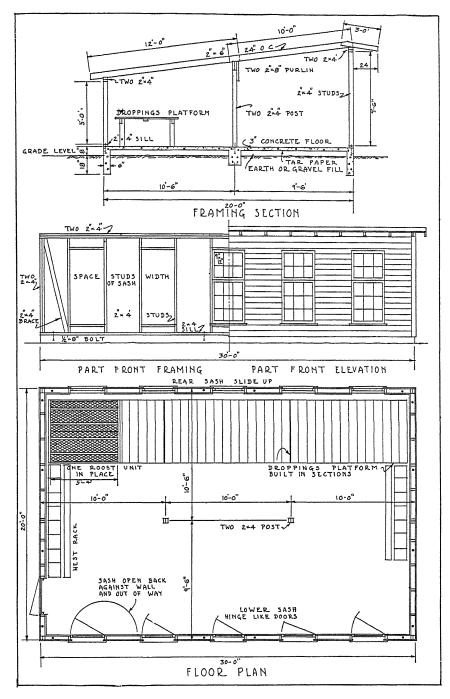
End view, front, and floor plan of 20- by 30-foot shed roof house.
